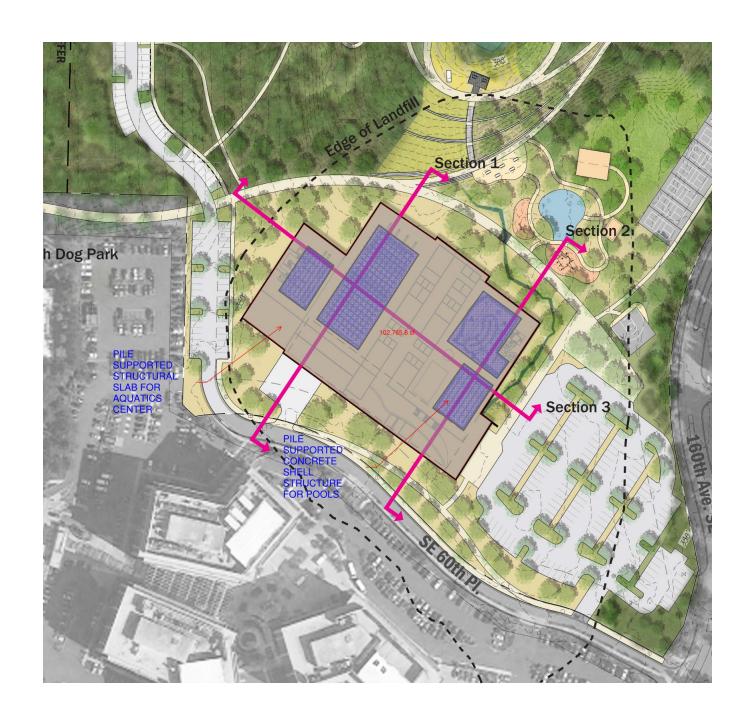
AQUATIC CENTER OVERALL PLAN — CONCEPT #2
